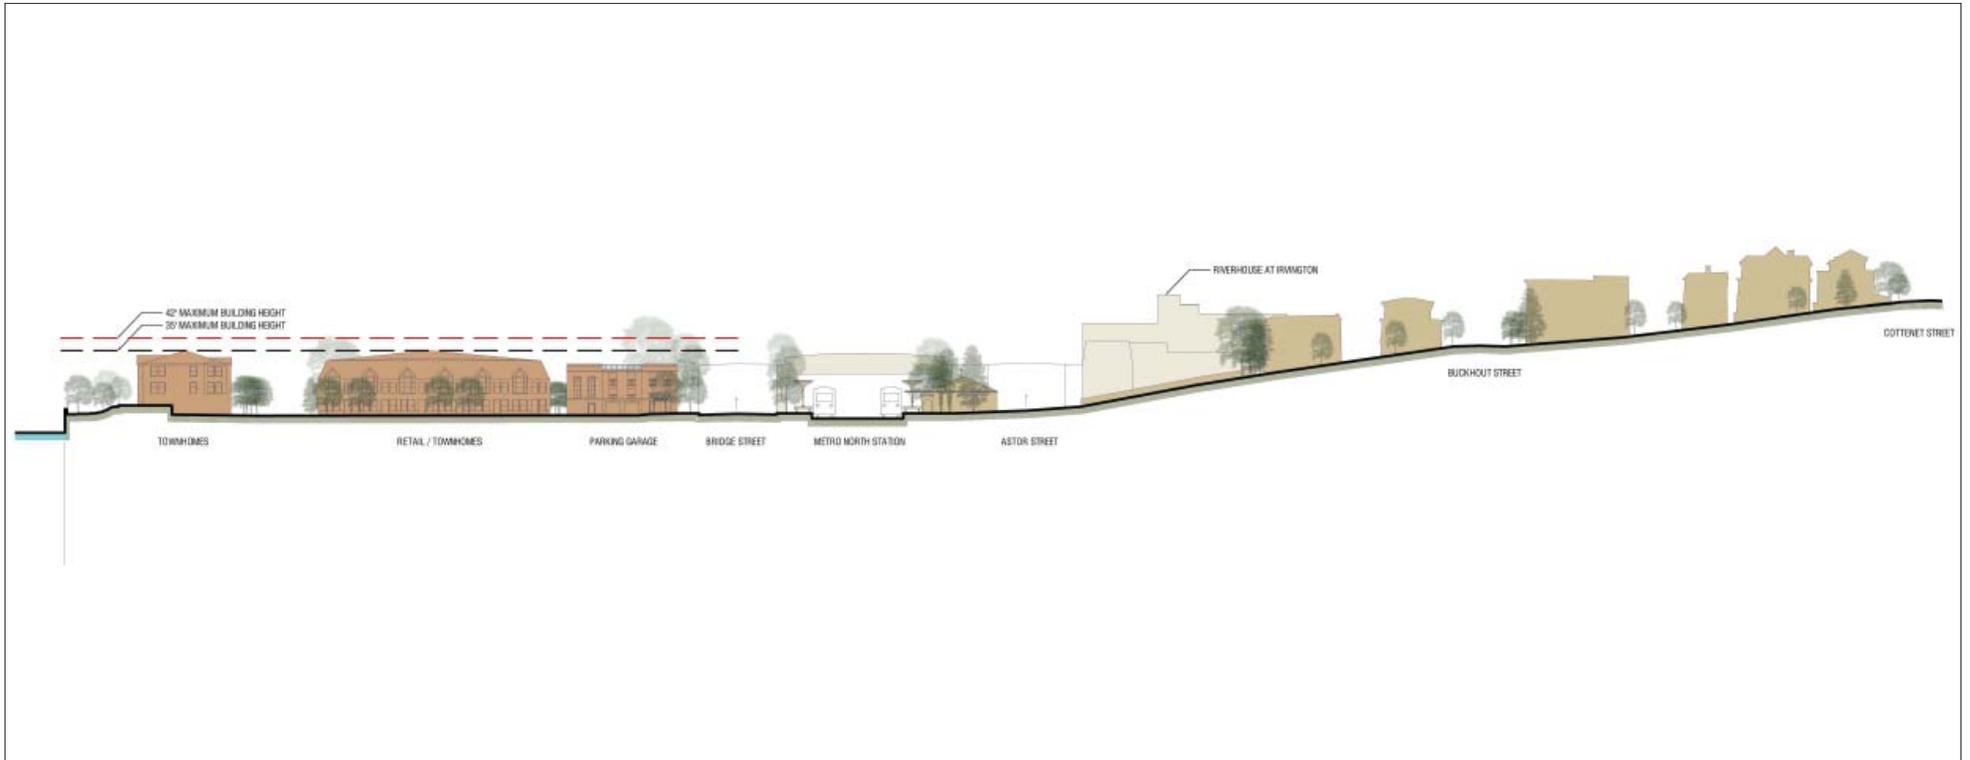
EAST-WEST SITE SECTION - BRIDGE STREET
